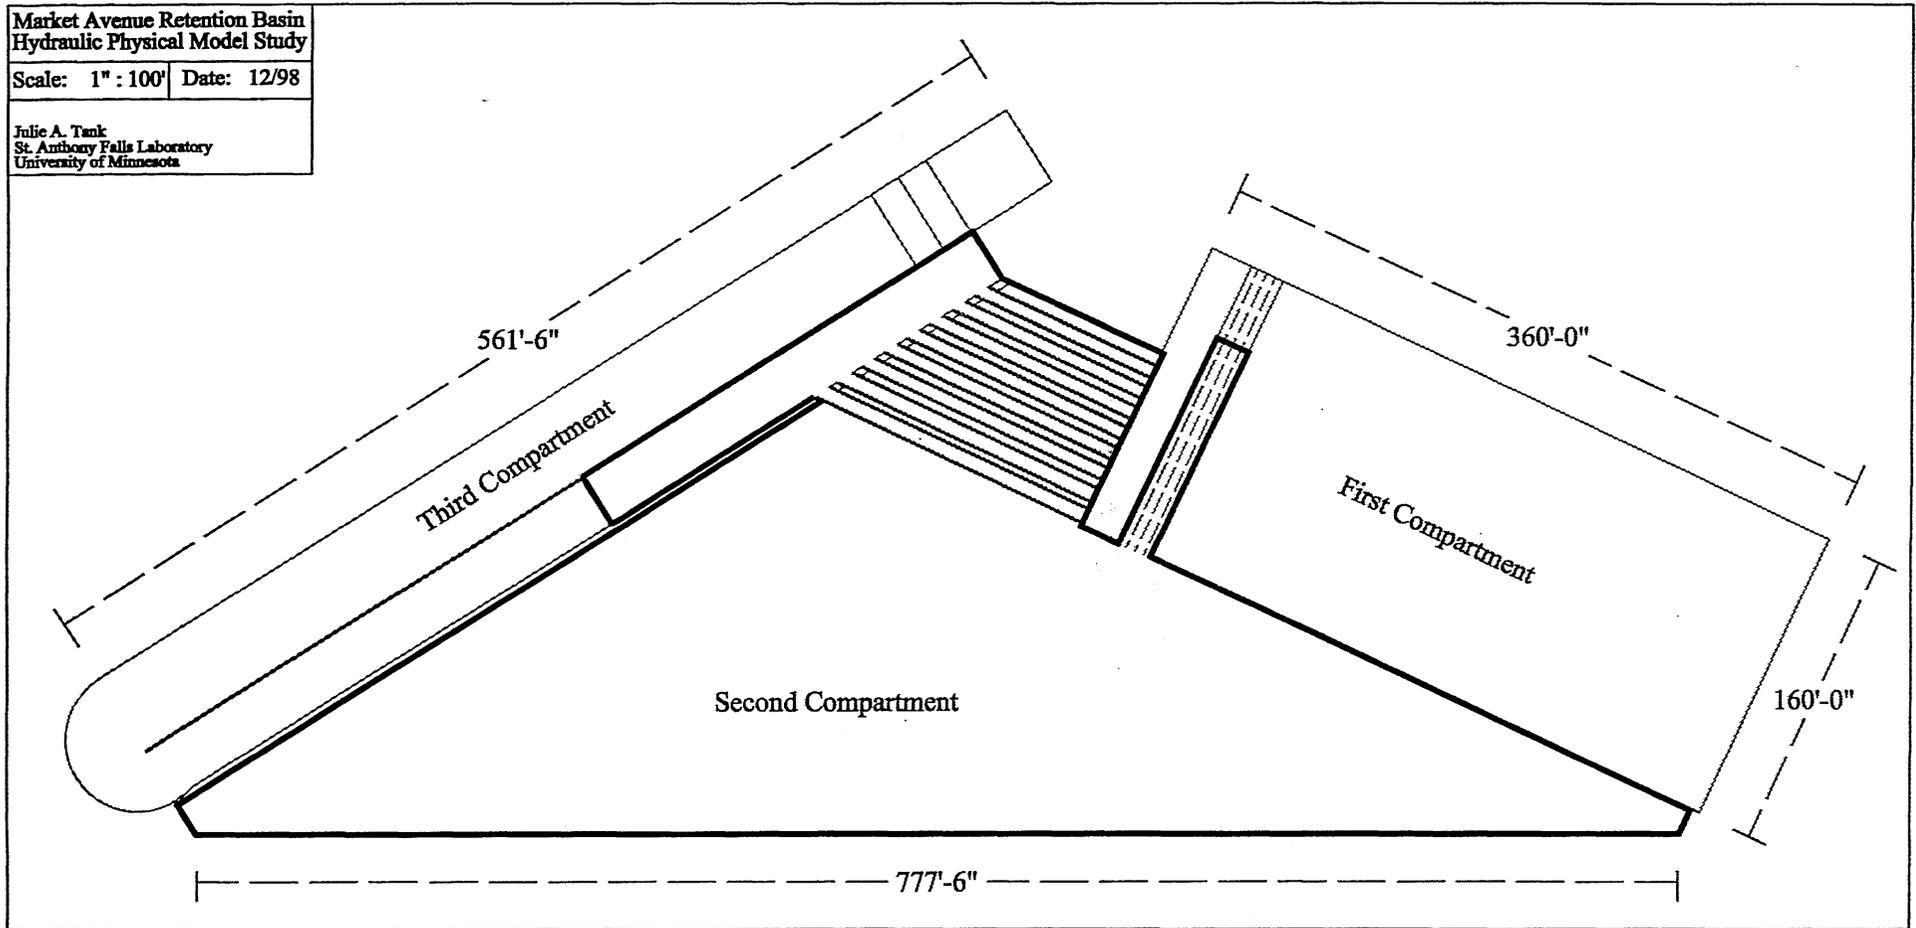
Plan view of MARB Facility Highlighting the Model Study Area
